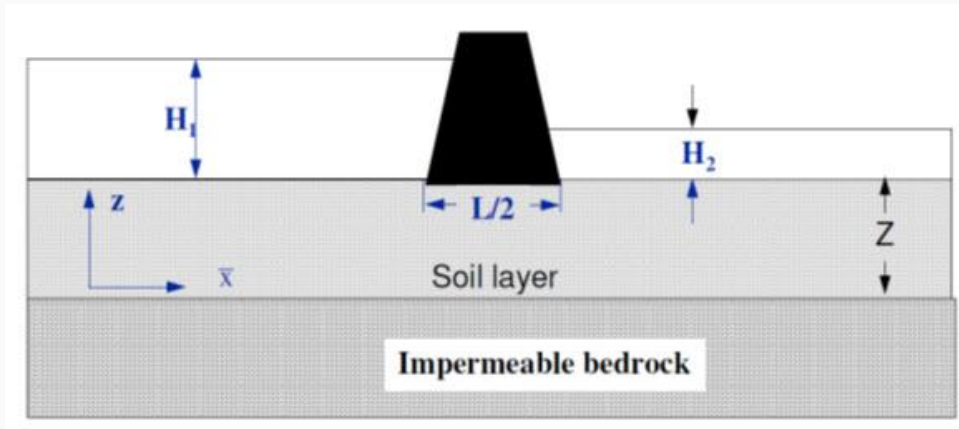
Dam on a permeable layer over impermeable rock (Transformed scale).
